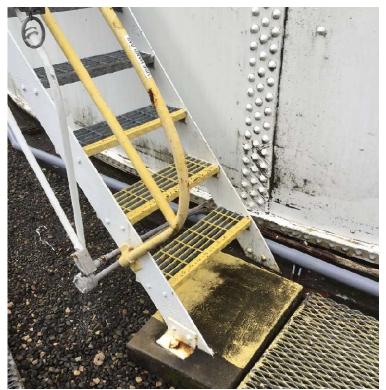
Typical Stair Anchorage at South Tank Farm
